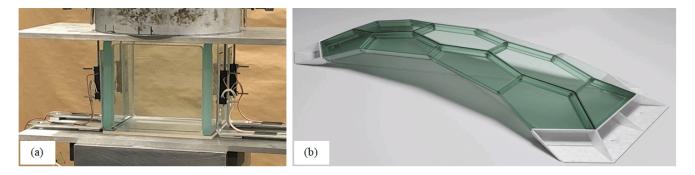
Future testing. (a) Interface material testing, (b) Small scale bridge testing of HGU connection detail
